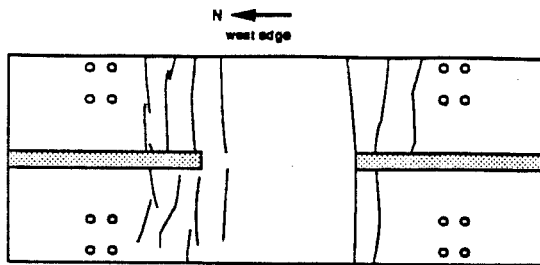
Sp. 2a: Progression of Cracking of Bottom Face of Roof Slab at Load Point 284
